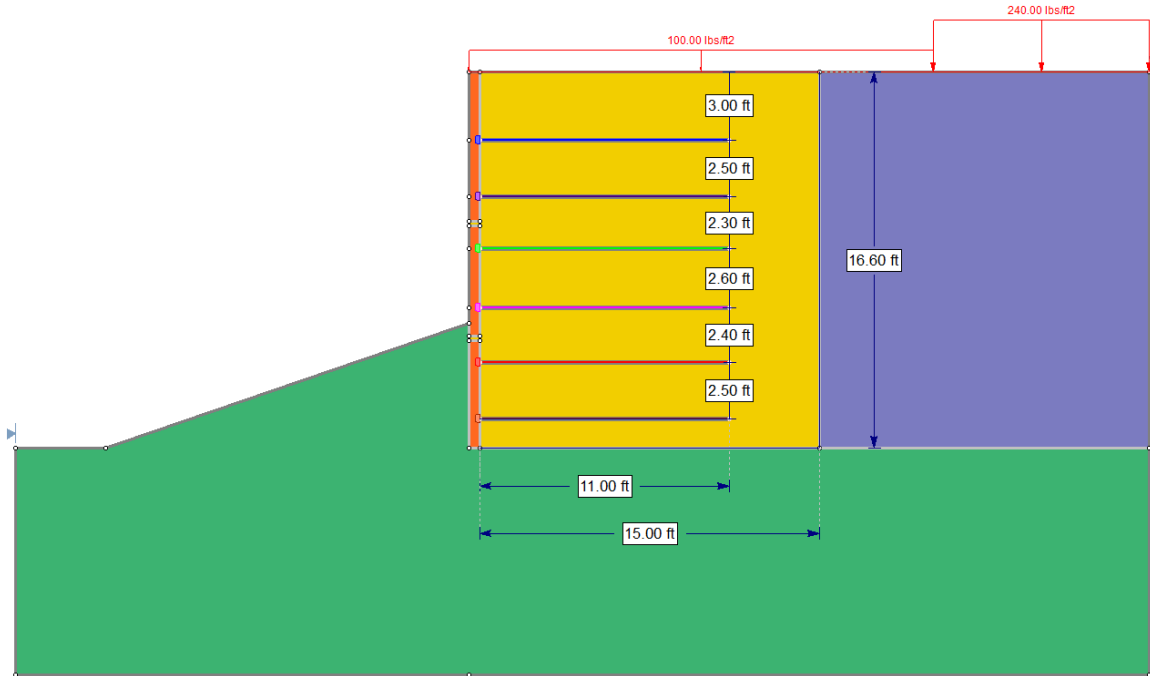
2D cross section geometry of the MSE wall at the excavation Section 1 (units are in foot).
